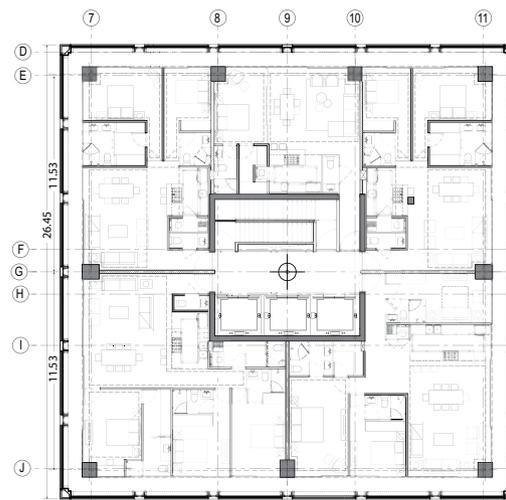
Architectural floor plan of a typical residential level for Santa Fe II, showing central core, nine perimeter columns, and façade elements. The columns along the sides of the building were located to coincide with demising walls between individual apartments
